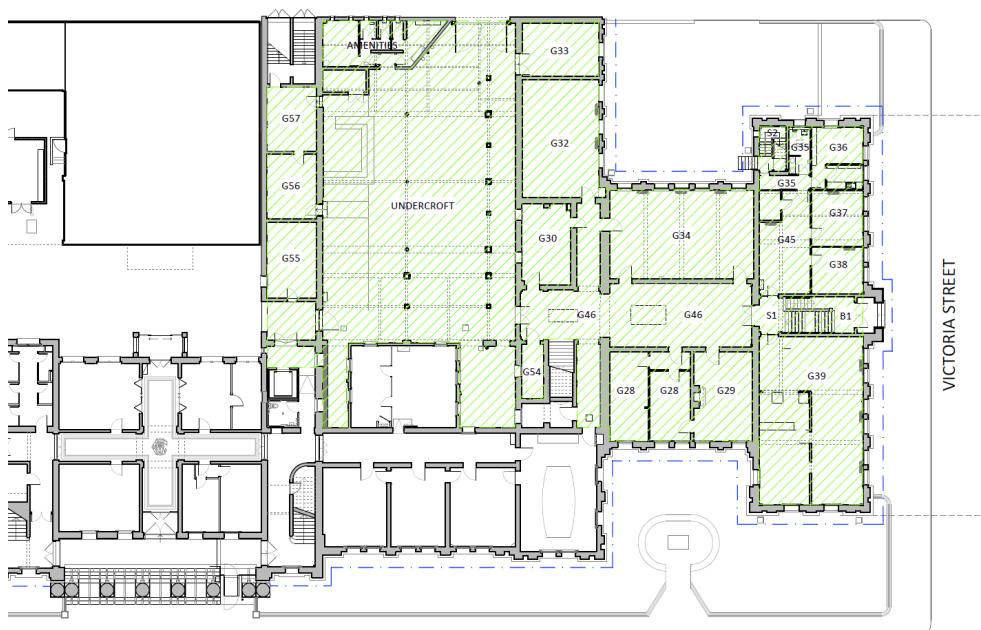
Ground floor plan indicating works areas (green shading) included in the project
